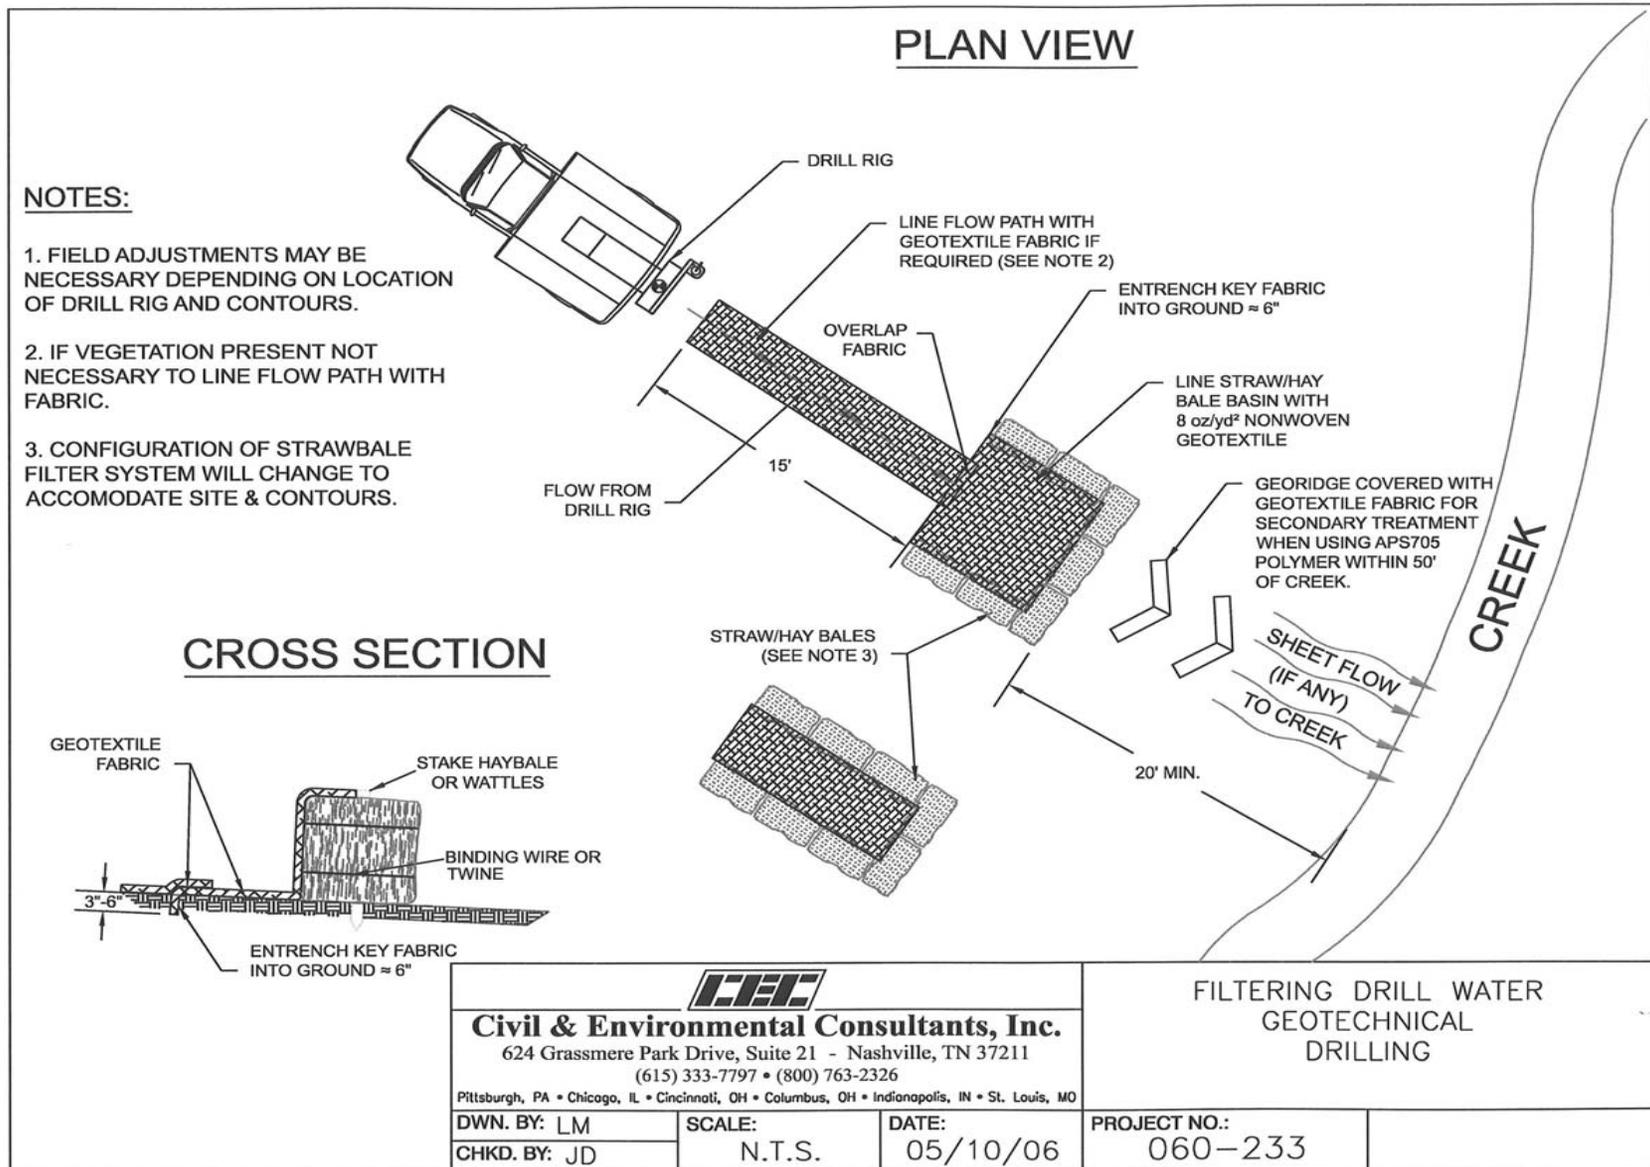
Geotechnical Drill Setup for Drilling Adjacent to Streams
